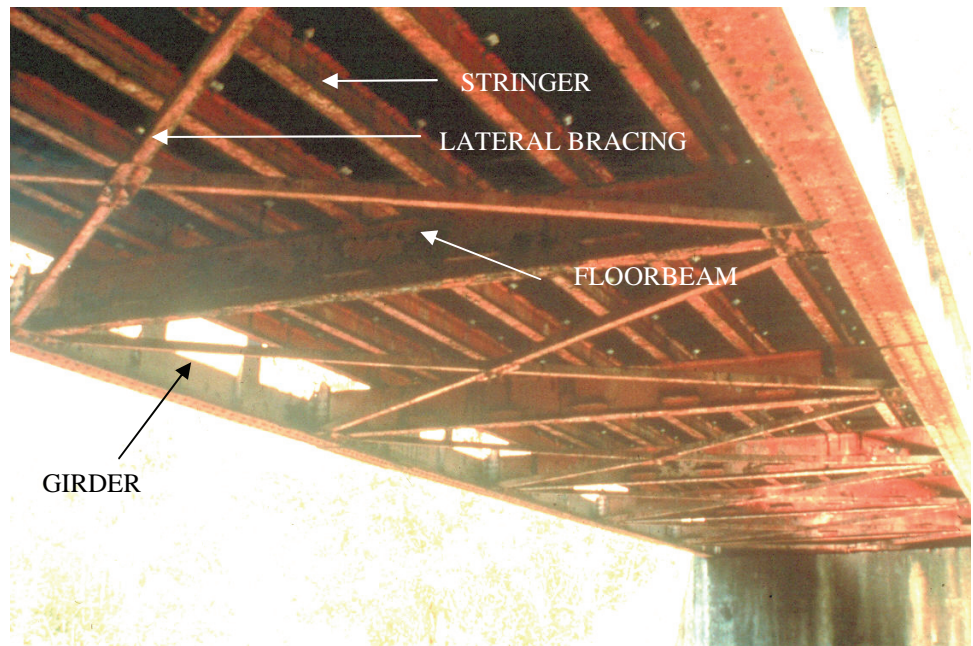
Underside View of Through Girder Bridge with Lateral Bracing
